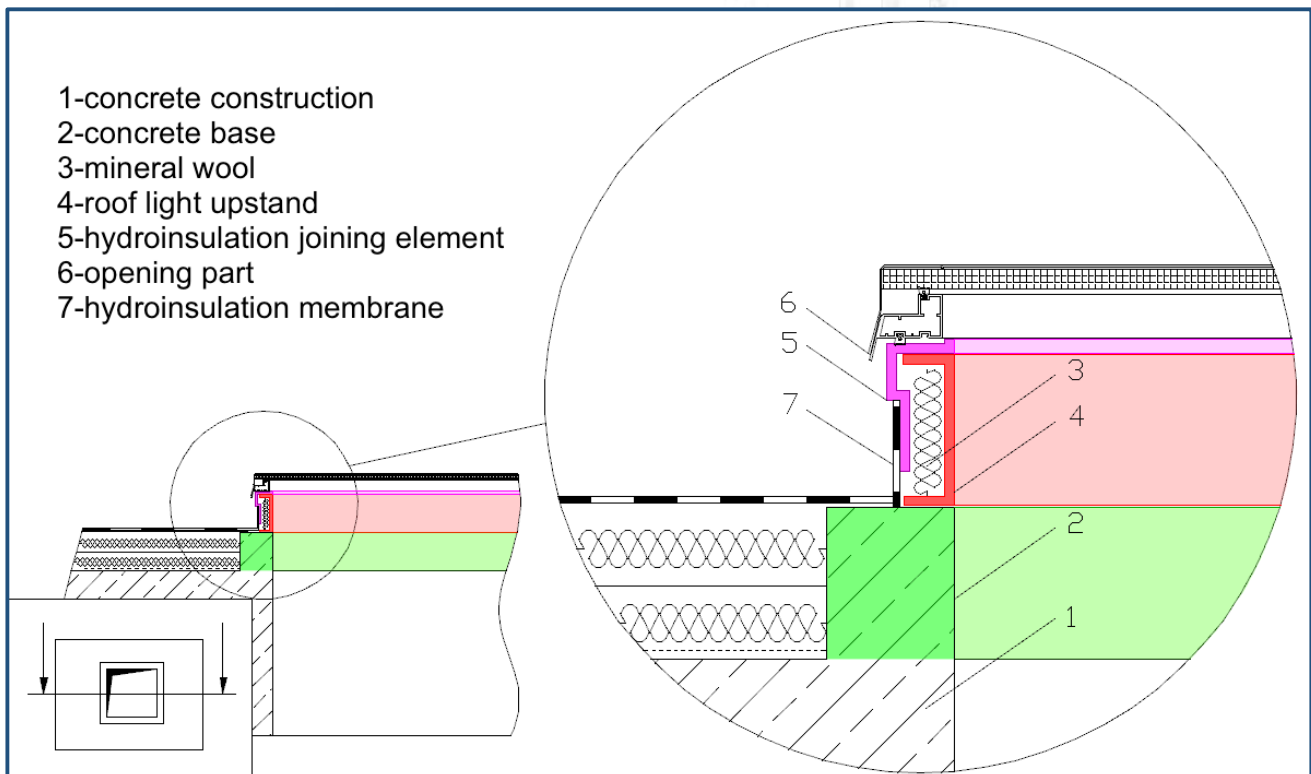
Installation scheme №1 - reinforced concrete roof / base
